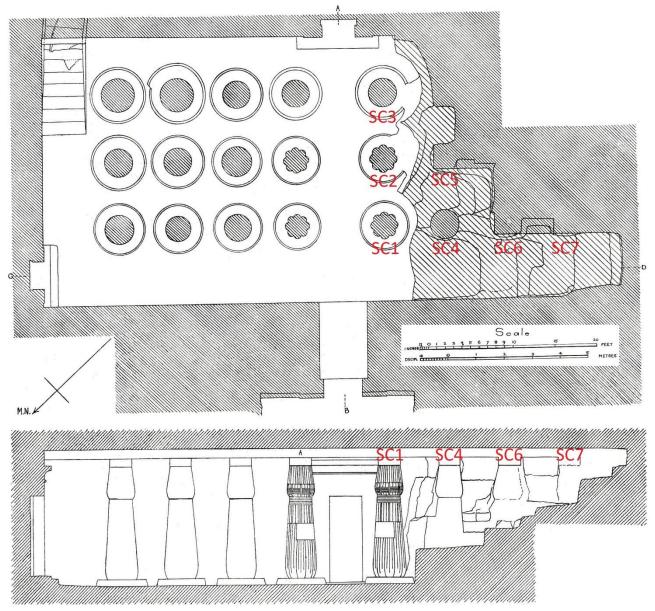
Tomb of Ay (AT 25). Excavation drawings of plan and section C-D. From Davies (1908), plates XXII-XXIII.
